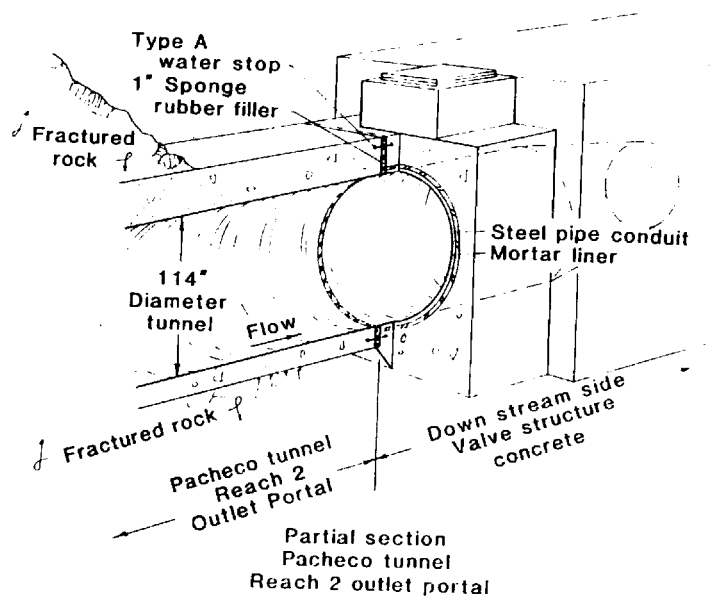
Expansion joint between the Pacheco Tunnel and a steel pipe conduit includes a 1-inch sponge rubber filler and a waterstop around the joint circumference.
